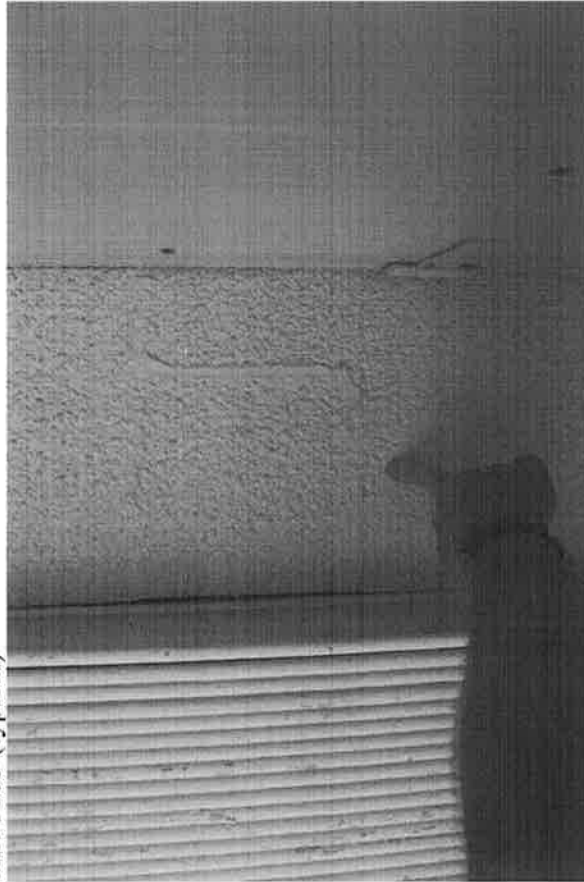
Area of prior repair to CMU wall at unit 1402 (typical)
